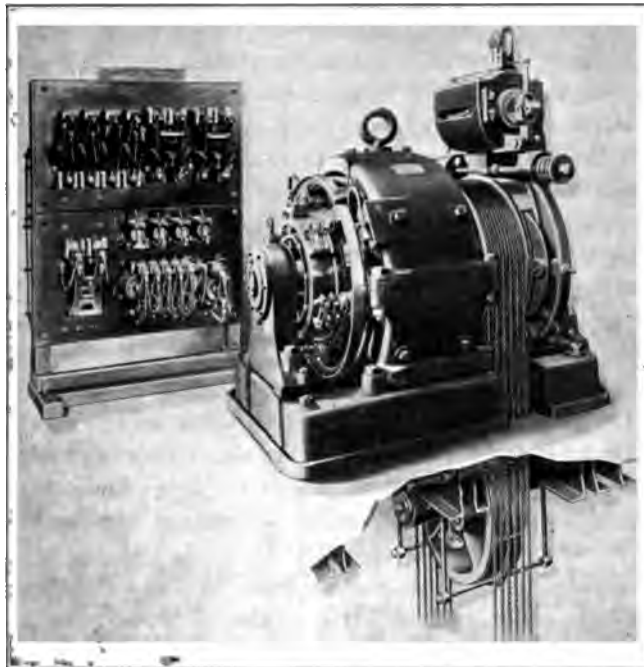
DETAIL VIEW OF THE OVERHEAD INSTALLATION OF A GEARLESS TRACTION ELECTRIC ELEVATOR
